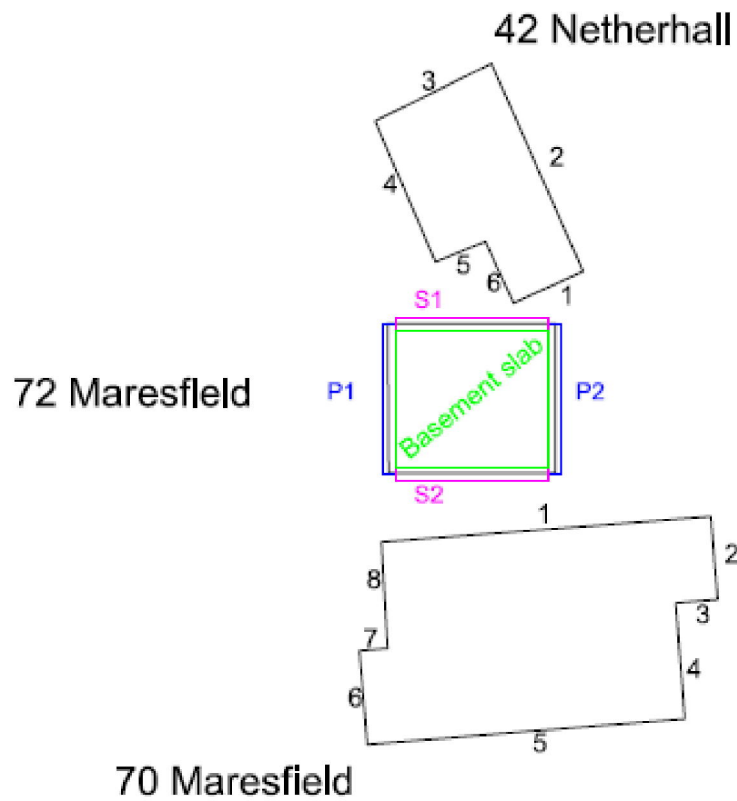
Simplified scheme and nomenclature for building facade/masonry wall elements (reference number noted). Loading strips indicated in blue and magenta (P1, P2, S1, S2). Basement slab loading area indicated in green.
